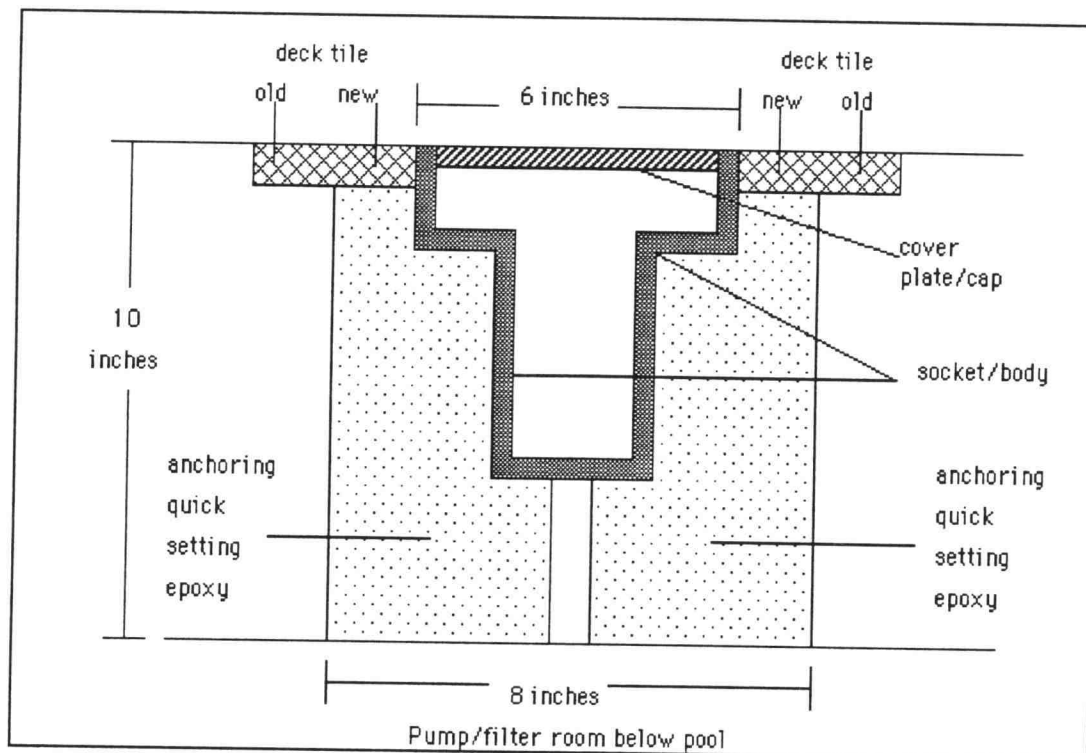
Anchor socket installed in floor of Langton Hall pool deck.
